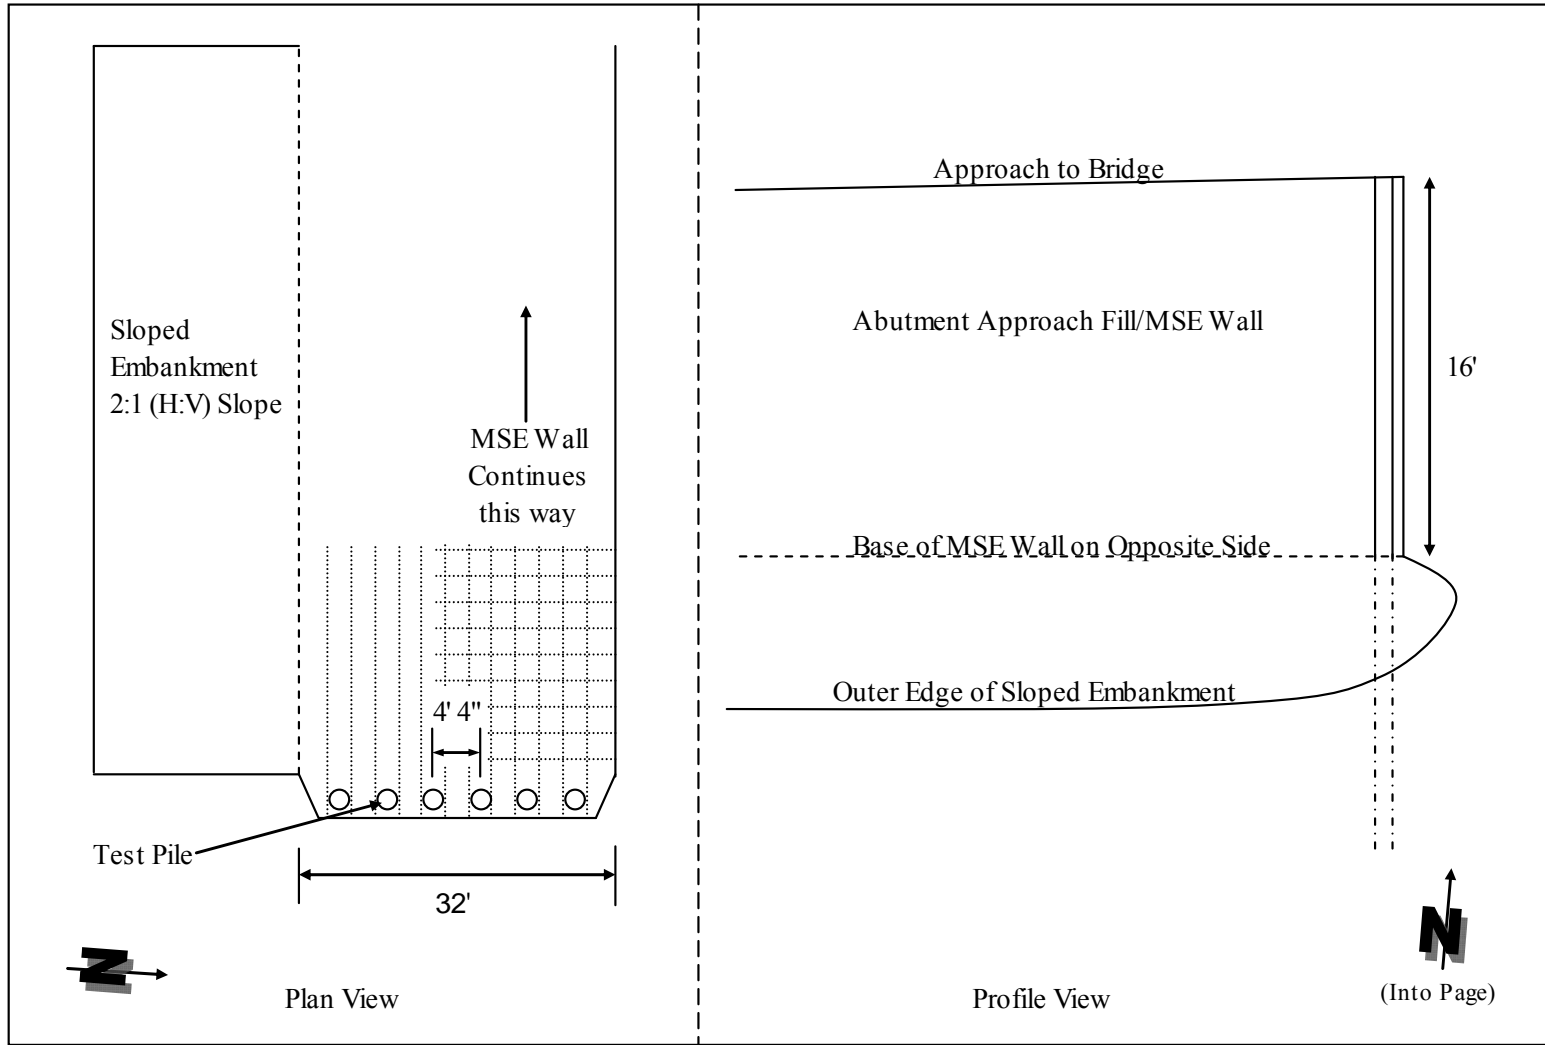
Plan and Profile View of West Abutment at SLCIA Site
